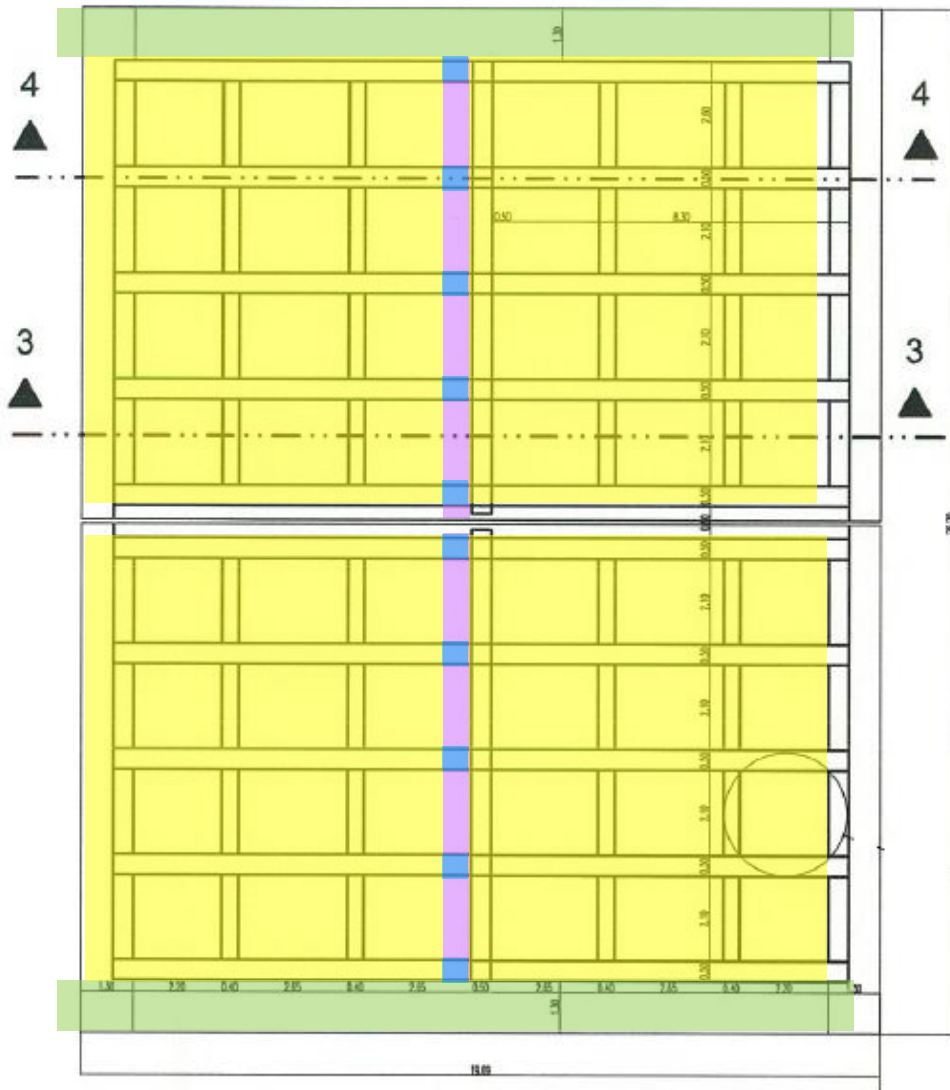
Disposition of cantilever slabs (green), top slab and deck ceiling beams (yellow), support columns (blue) and abutments () in plane of the bridge (bottom side)
